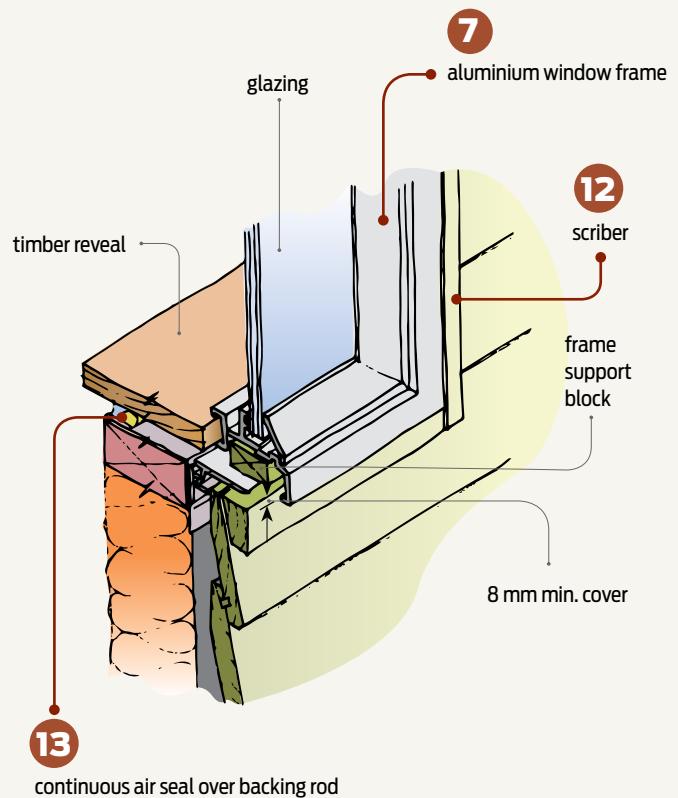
Steps 7, 12 and 13: Install window and finish sill.
